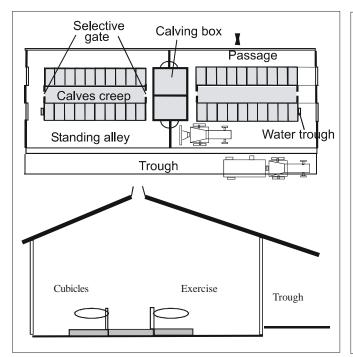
Layout and cross section from head to head cubicles with calves creeps between cubicles rows
